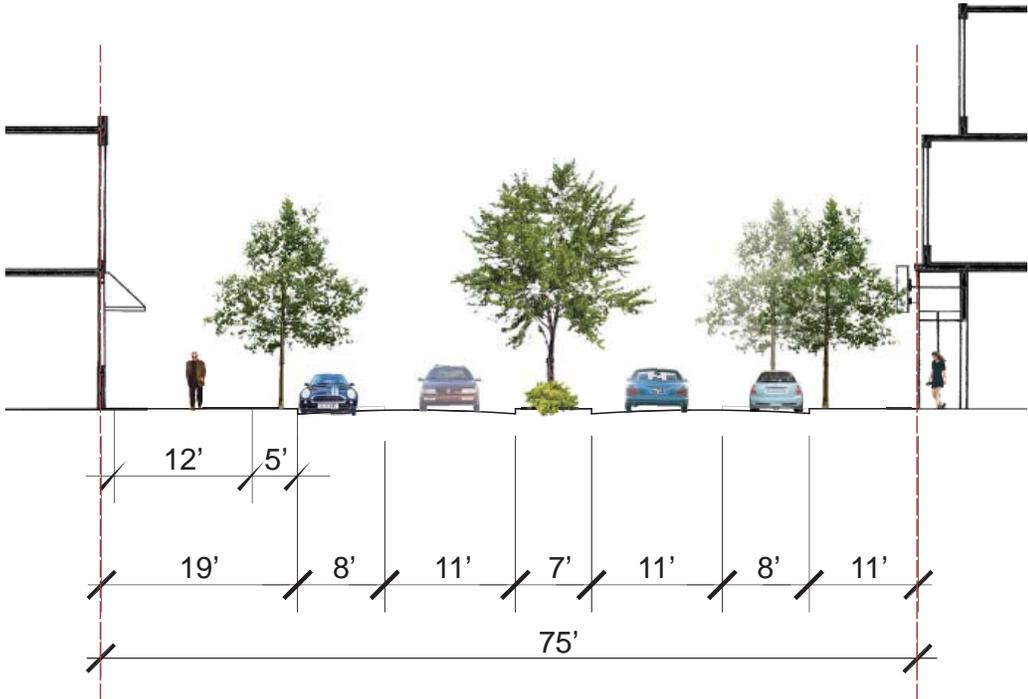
Section through Santa Cruz Avenue showing two traffic lanes with parallel parking, median trees retained, diagonal parking removed, one moderately-sized sidewalk and one wide sidewalk
